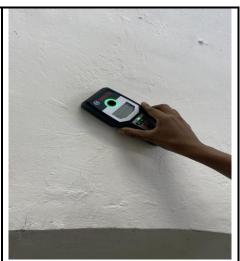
Radar device indicating no brick force/brick reinforcement on external wall on western building
